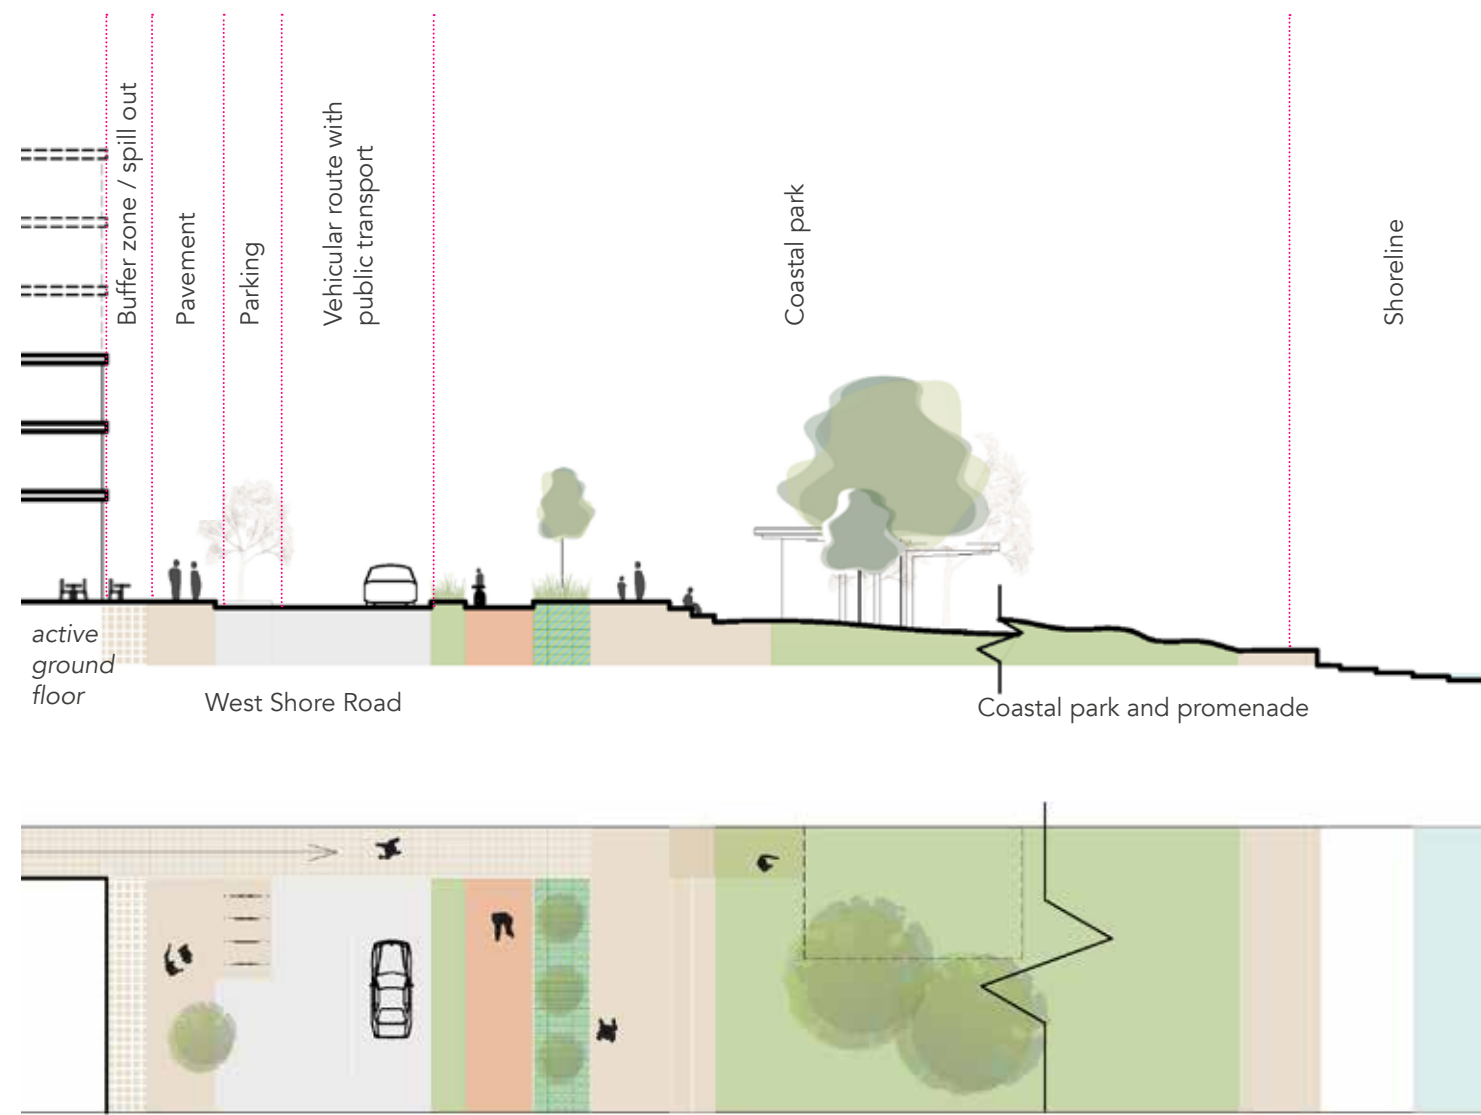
Illustrative section and plan for the coastal edge, West Shore Road and coastal park
